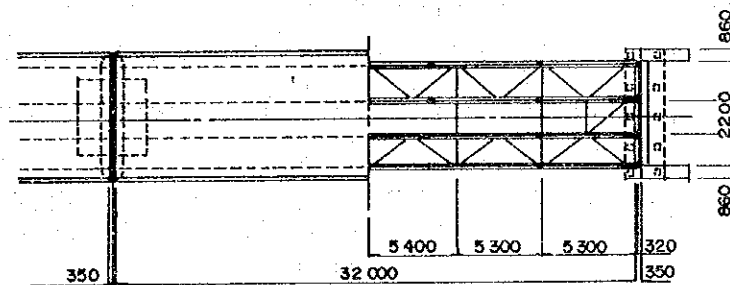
TYPICAL GENERAL VIEW OF SUPERSTRUCTURES (H-BEAM COMPOSITE GIRDER)
